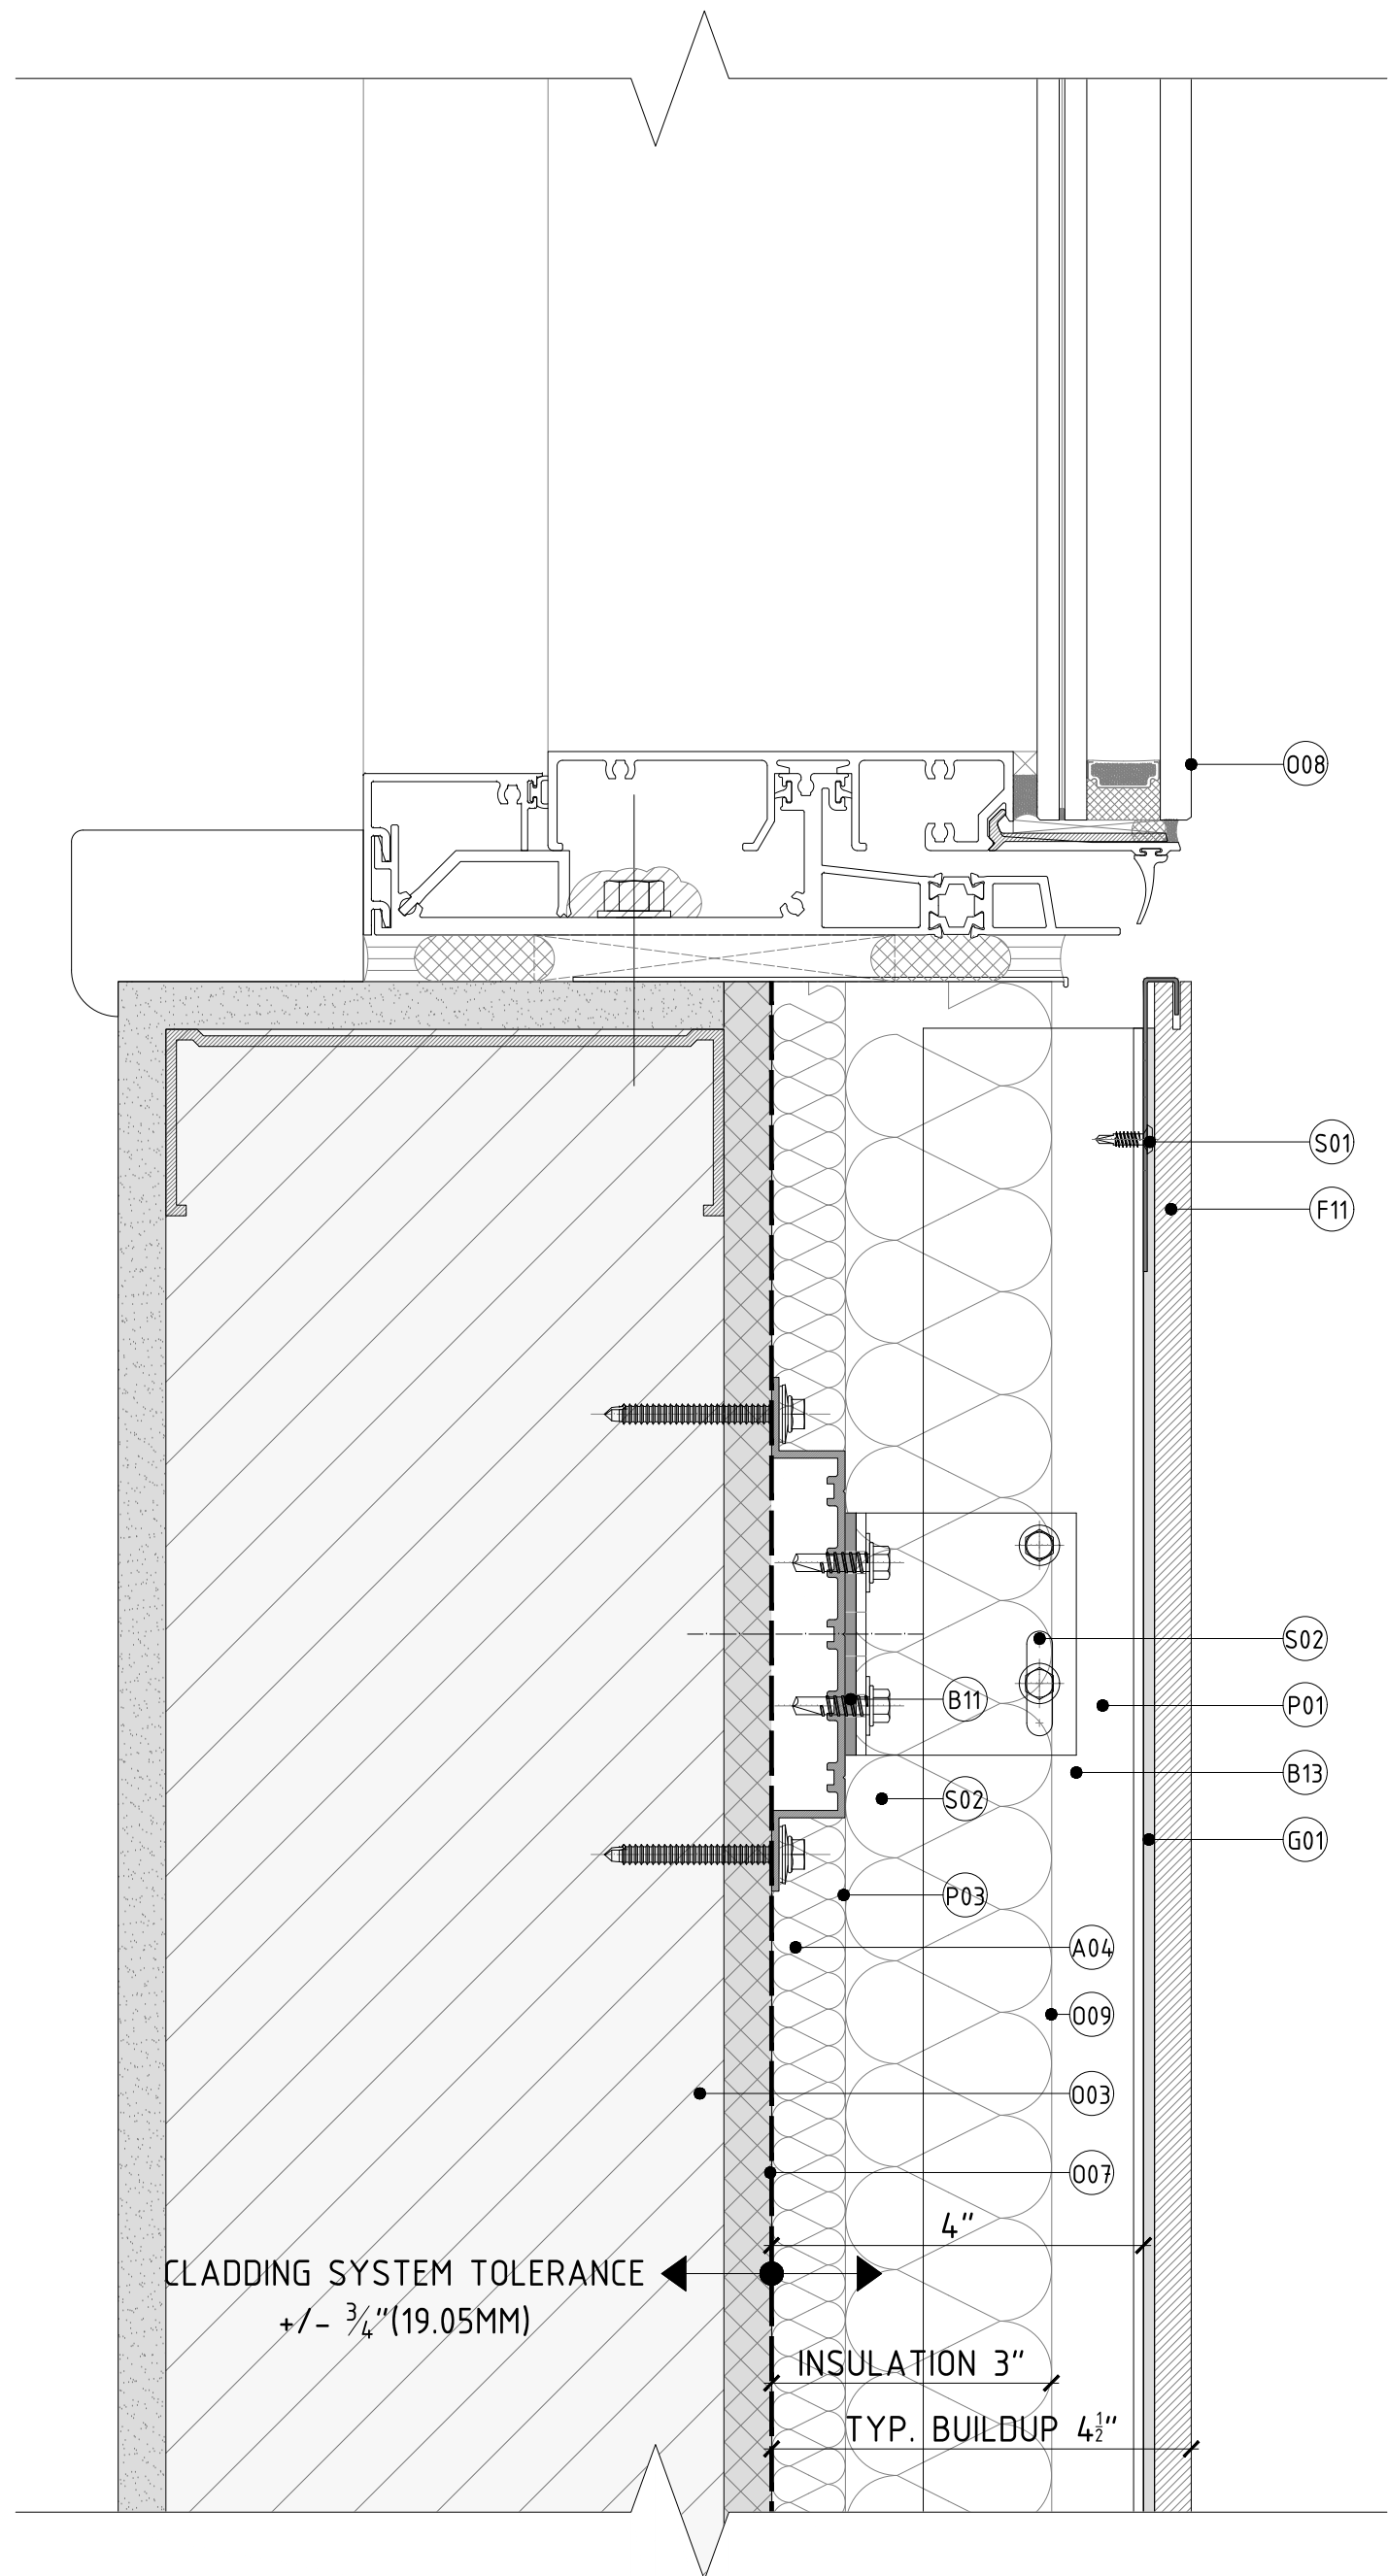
DETAIL A - TYP. JAMB DETAIL W/OUT RETURN
